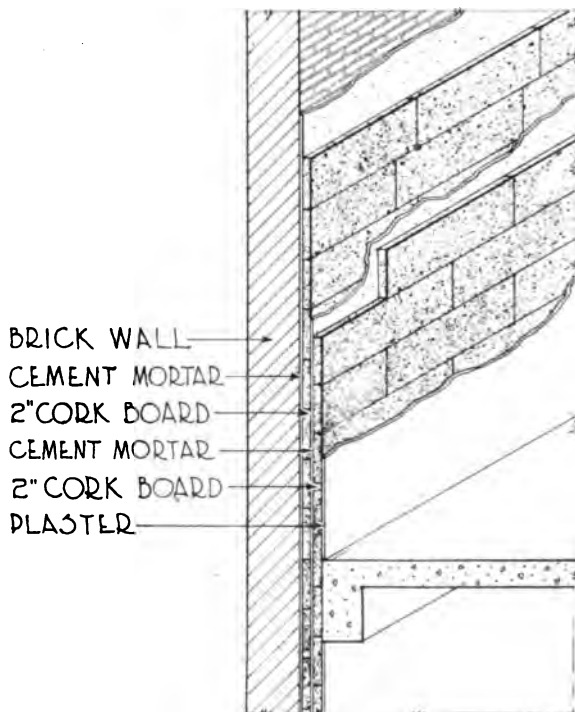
DETAIL OF BRICK WALL INSULATION.
